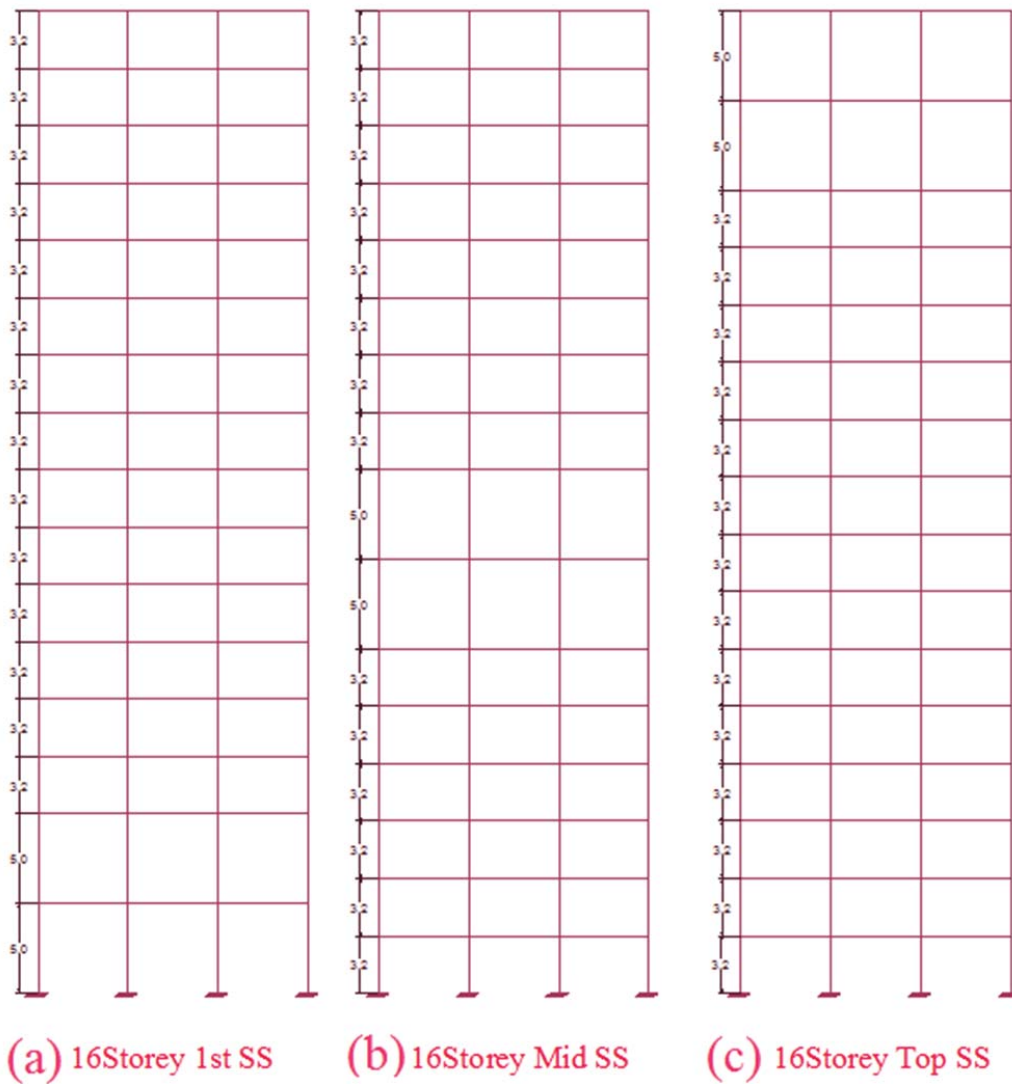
16-storey configuration, (a) SS at 1<sup>st</sup> floor. (b) SS at middle floor (c) SS at last floor
